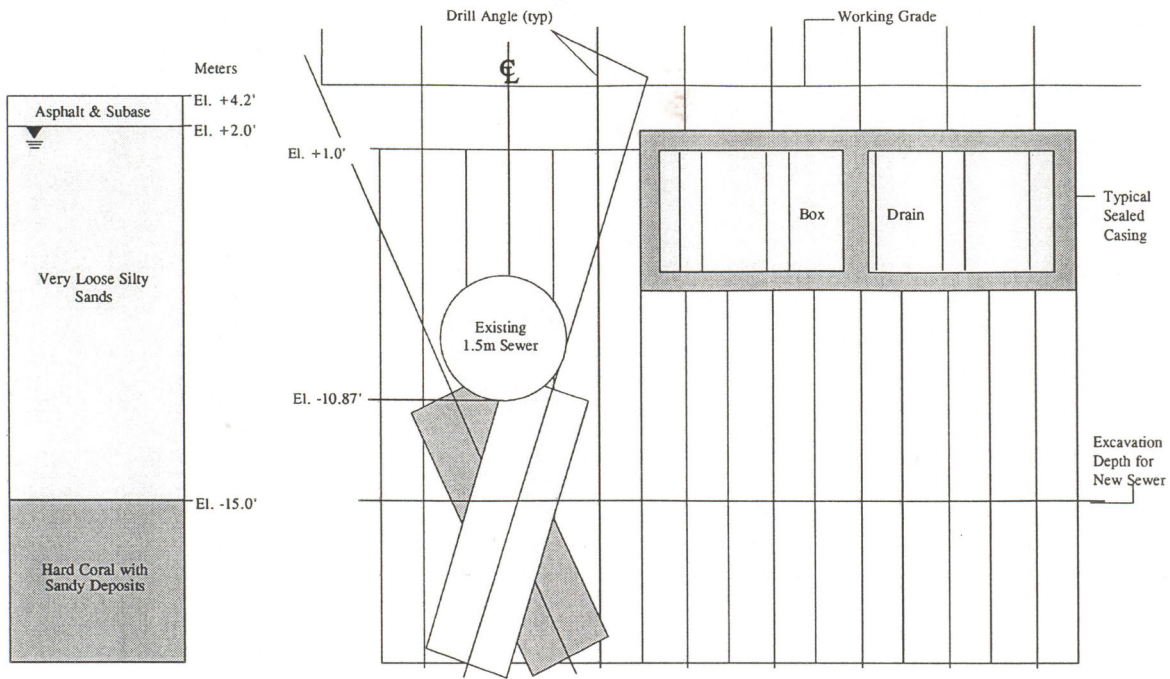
Soilcrete Columns Angled to Protect Existing Utility.
